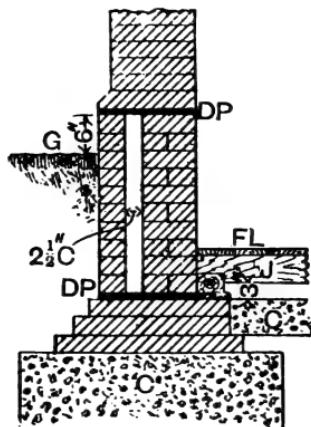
Damp-proof Course when Floor is below Ground Level.
